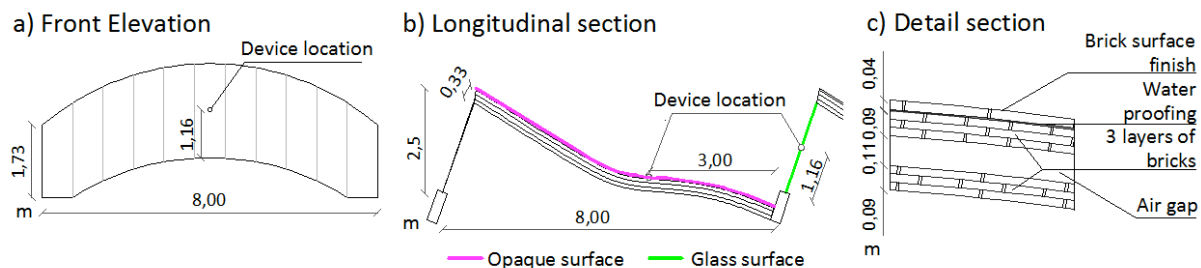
Construction specifications a) Front elevation b) longitudinal section and c) detail section.
